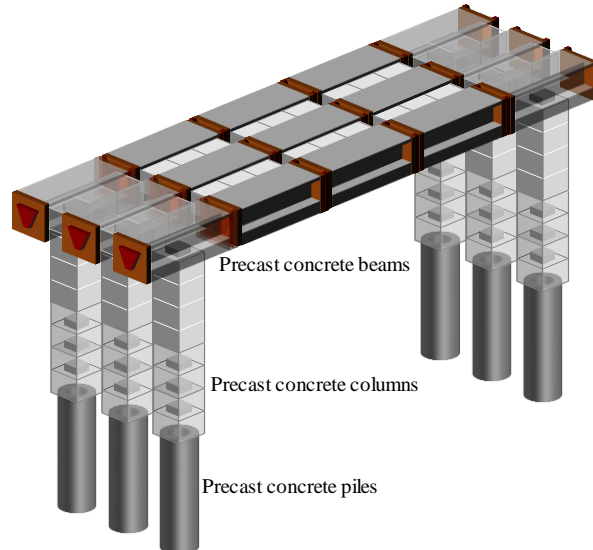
An example of a temporary bridge using precast concrete blocks [2]
